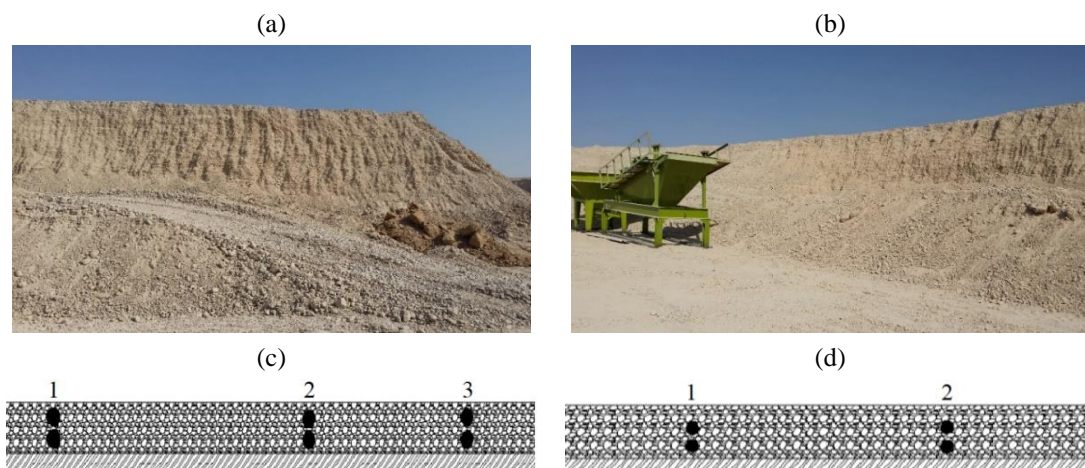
Location of sample procurement for Farshoot (a) wall side section 1 (b) wall side section 2; (c) sample location with depth 1; (d) sample location with depth 2
